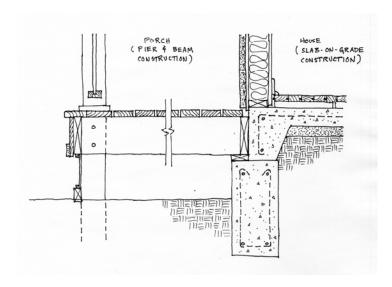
A combination foundation with a porch on pier and beam and the main structure on slab.
